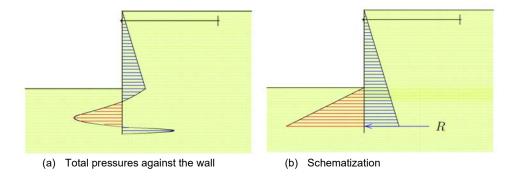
Blum's schematization of pressures against a sheet pile wall [5]
